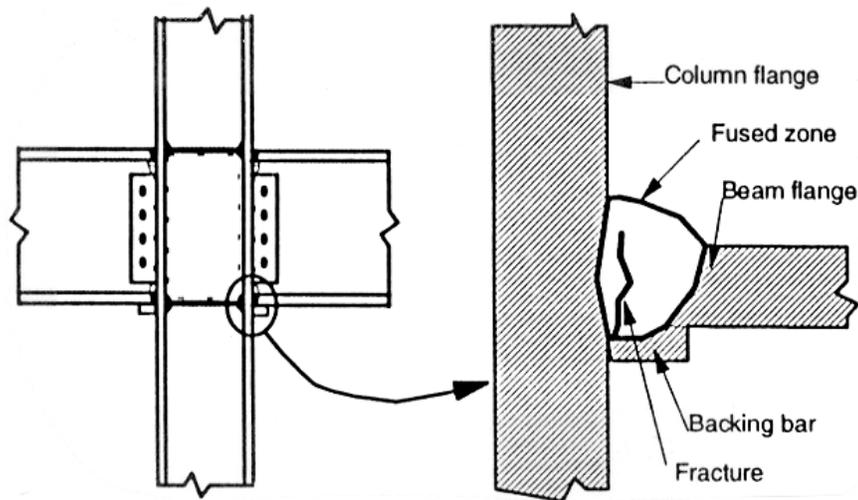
Typical Fracture of Welded Beam-column Joint During the 1994 Northridge Earthquake
